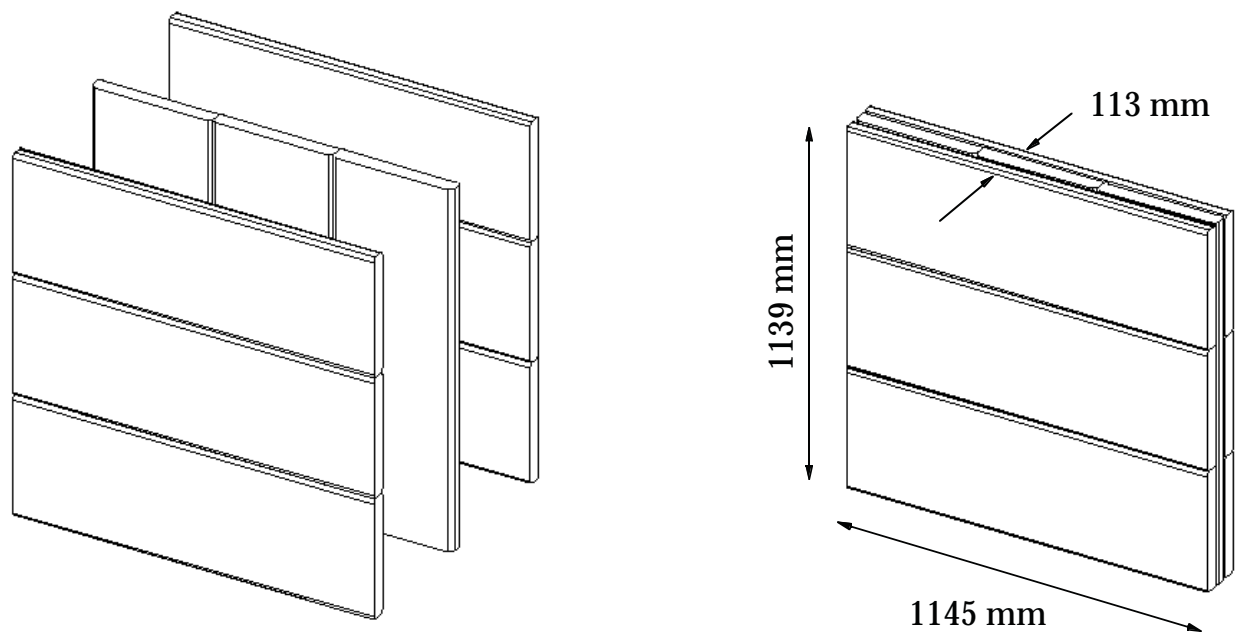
Specimen L45, a triple layer built-up lumber specimen consisting of nine “2x12” studs. Both dry and wet specimens were tested.
